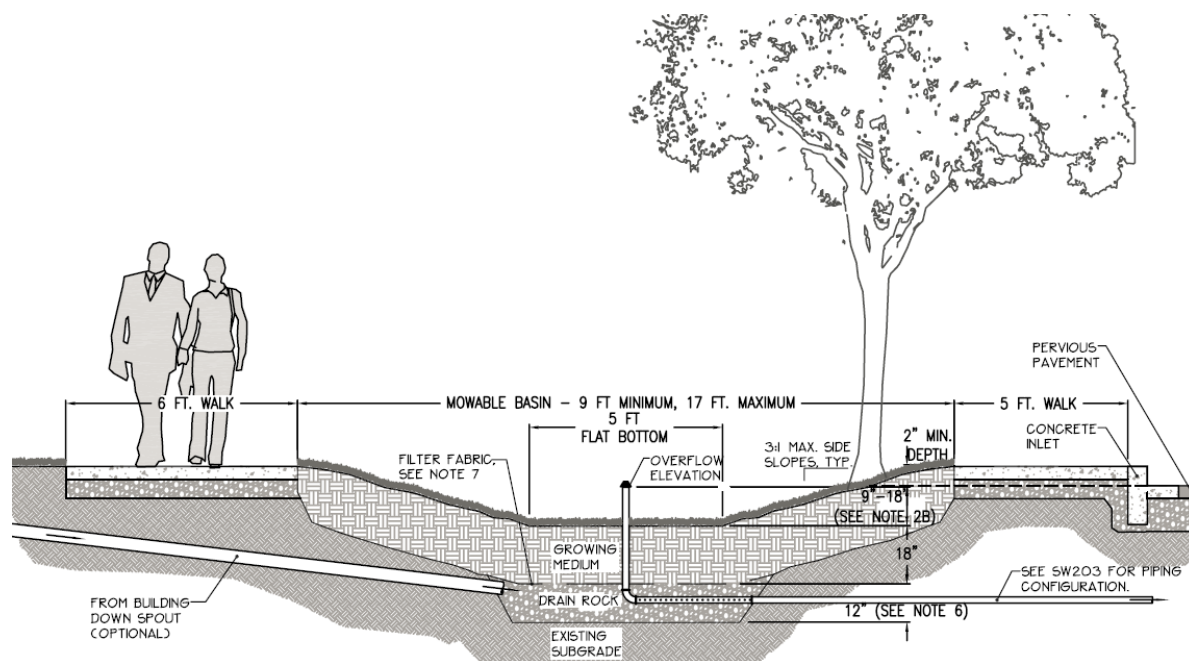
Example of an infiltration BMP taking rooftop drainage
